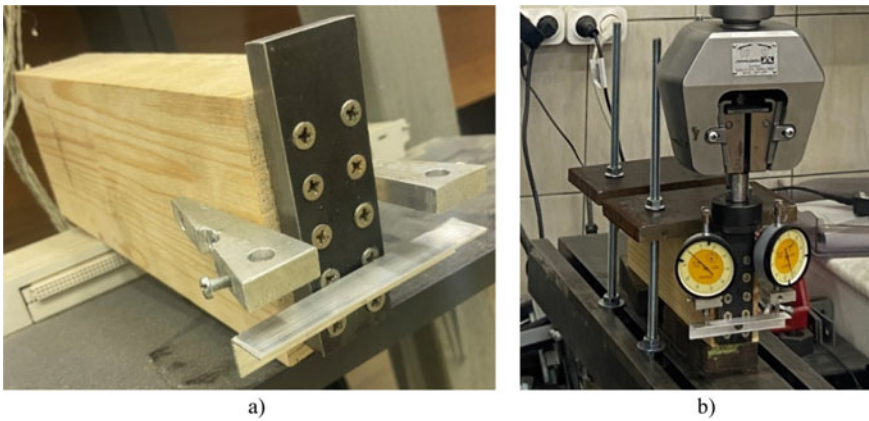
a General view of the manufactured sample; b General view of the manufactured sample with installed dial gauges in the testing machine
